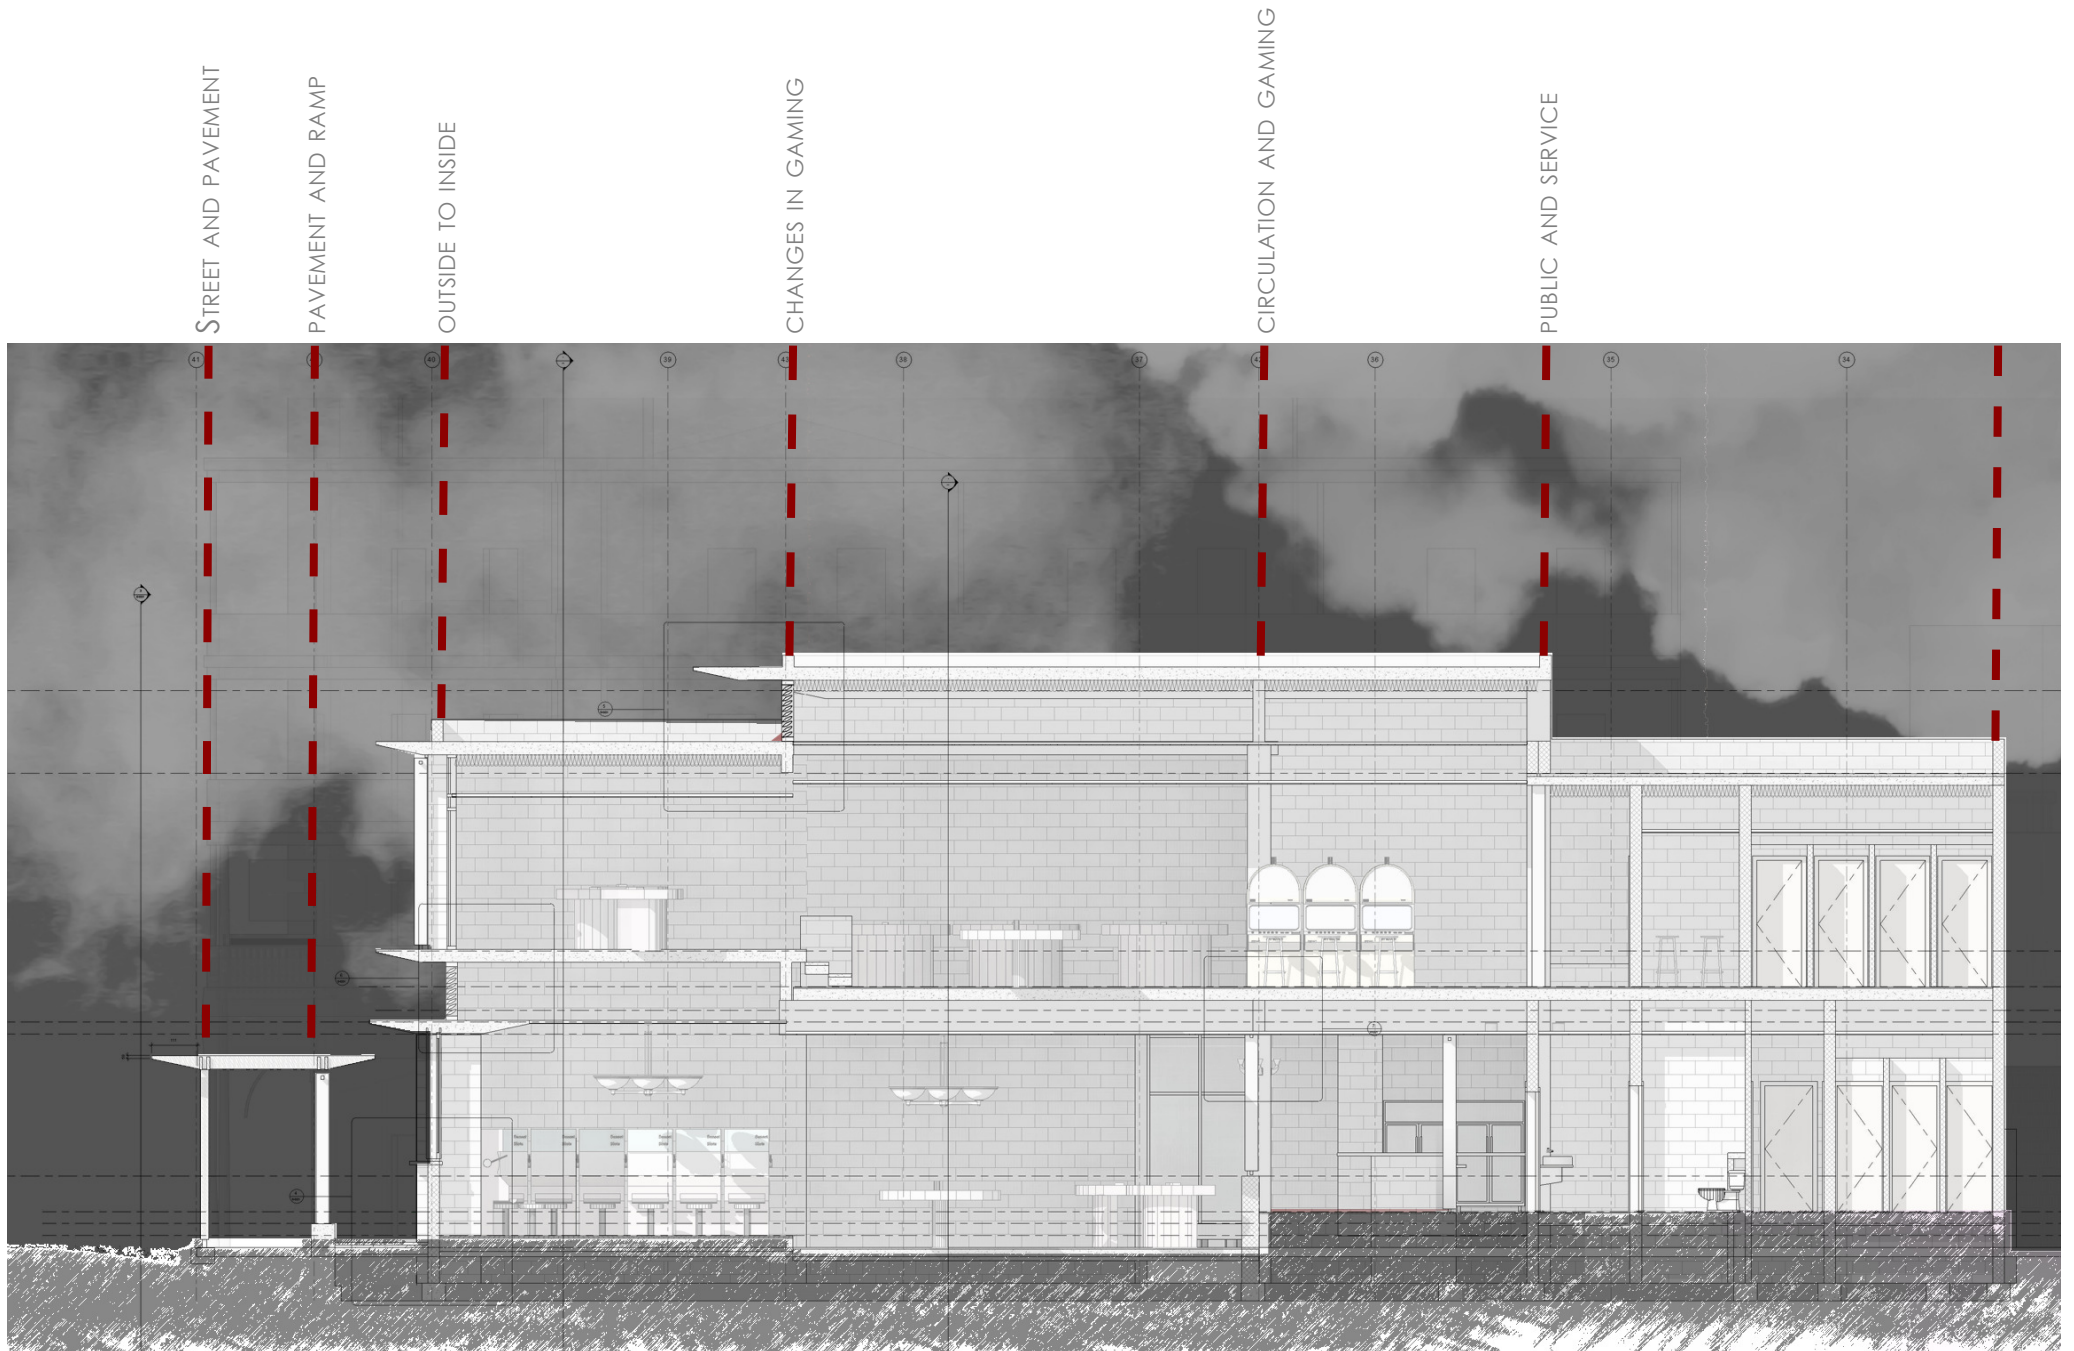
Section through gaming facility showing ppposition of transitional columns and threshold barriers.
